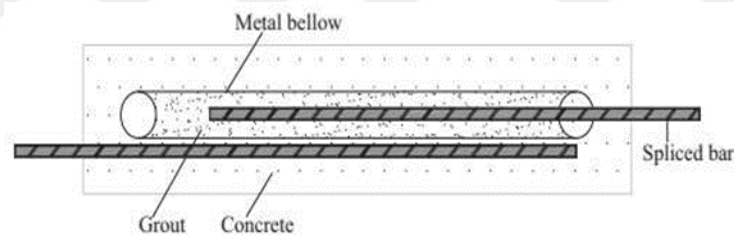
Grouting of Metal Bellow For Lap-Splicing.
